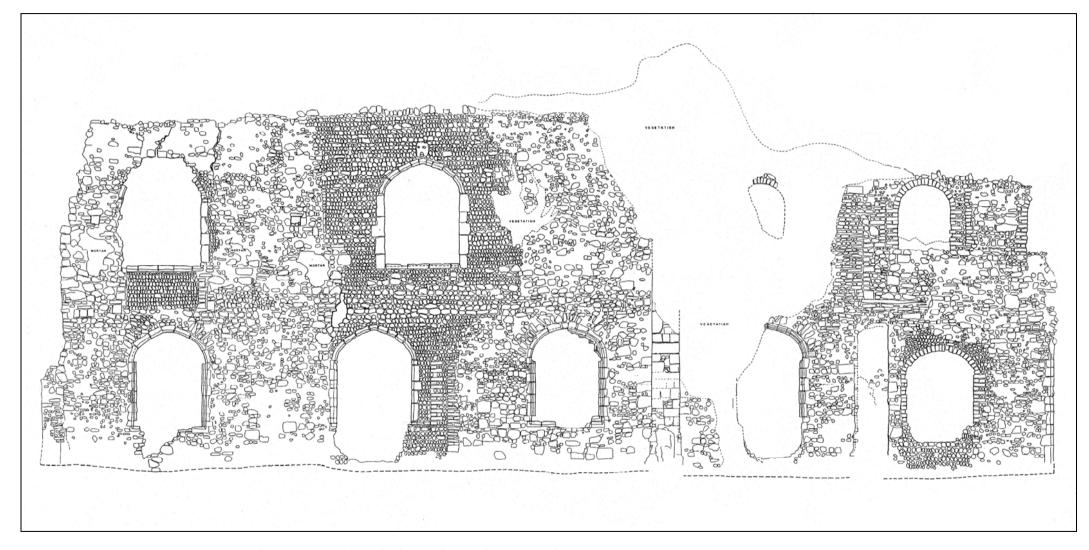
c.1:70 scale elevation of the north wall (0050) of the refectory (Terrestrial Surveys 1990)
